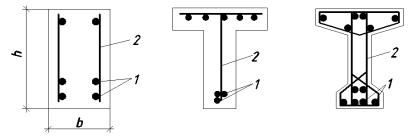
Cross-sectional shapes of beams and schemes for their reinforcement: 1 -longitudinal bars; 2 -shear bars
